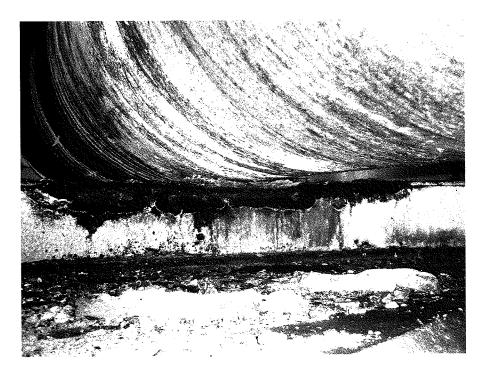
Structural Steel in Good Condition with Minor Surface Rusting (North Bay)
